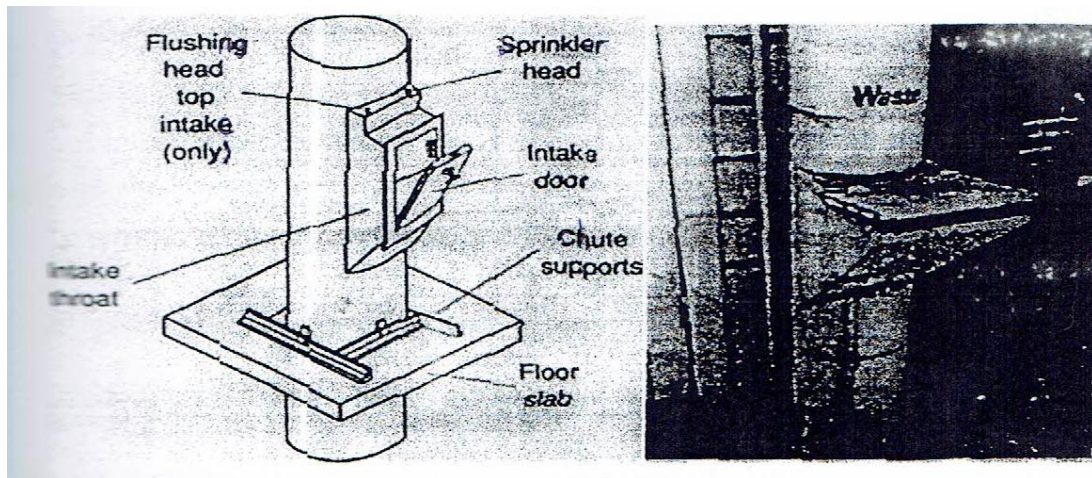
Typical chute openings for the discharge of waste materials in high-rise apartment buildings: (a) isometric view of waste chute opening on individual floor and (b) outdoor type used in some older high-rise apartment building.
